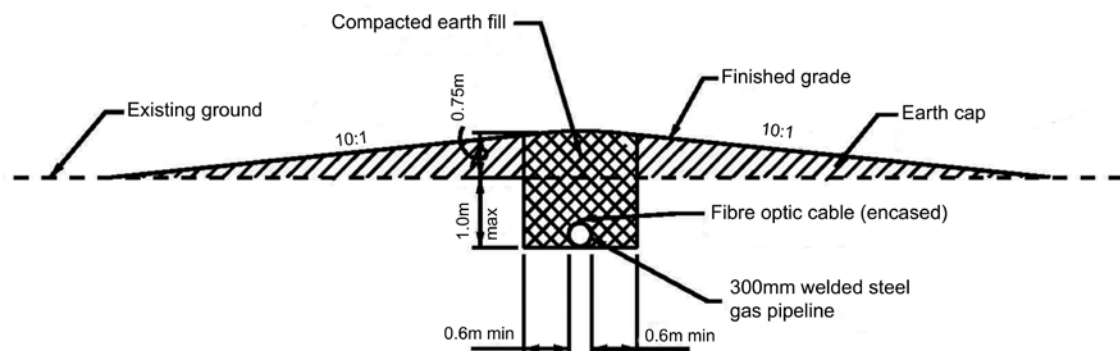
Cross-section view of a pipe crossing at crown of levee (courtesy City of Paducah, Kentucky, Paducah Levee System)
